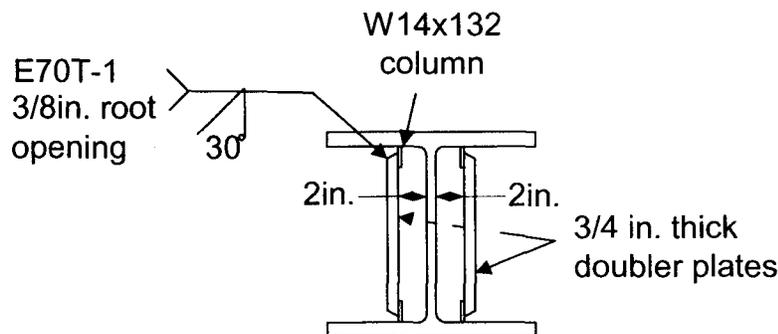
Box detail with doubler plates welded to column flange away from web with CJP welds
